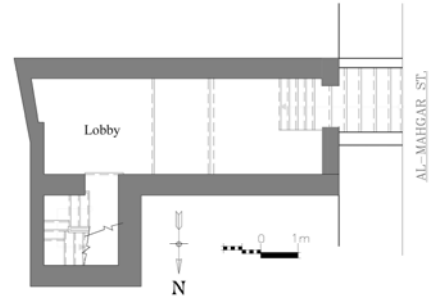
Bayt Sitt Şabah: Ground floor Plan
